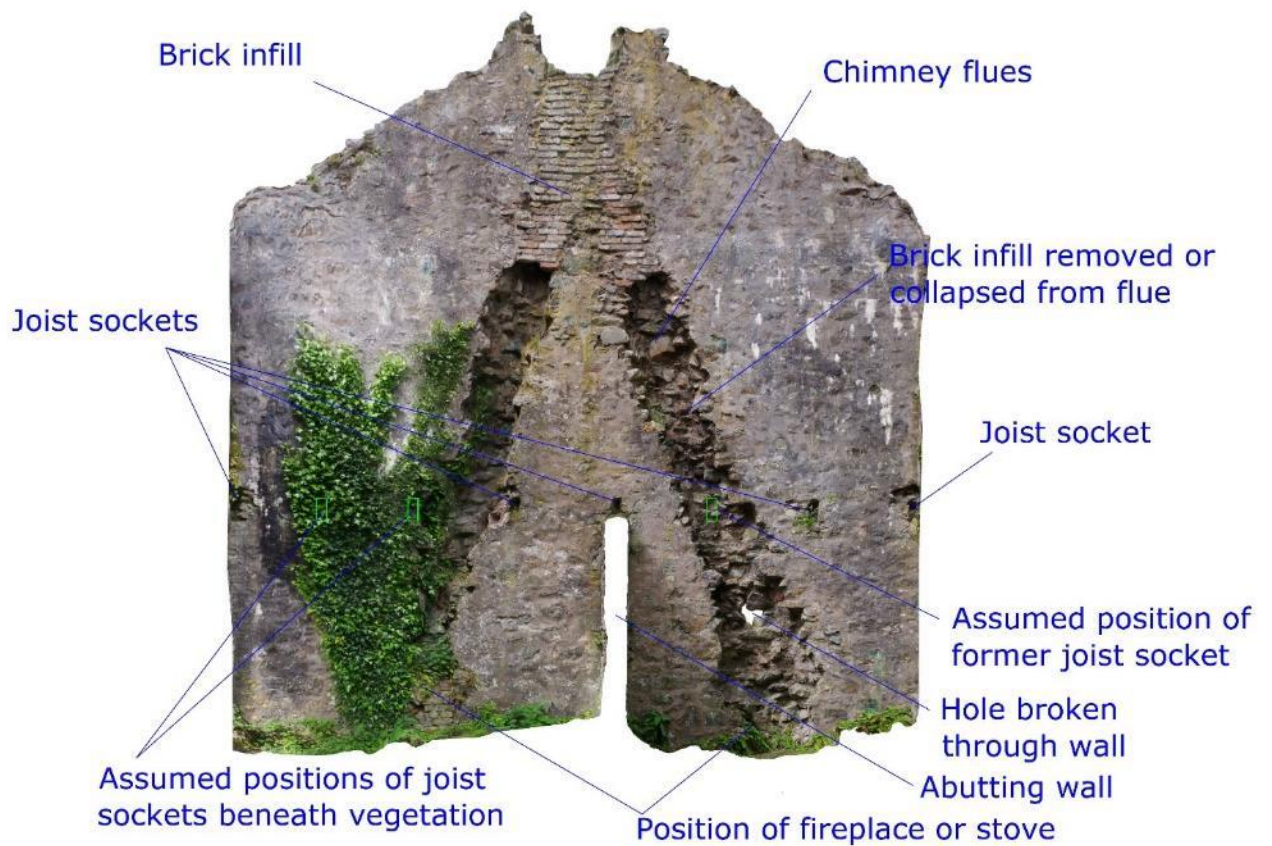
Rooms 7 and 8 (ground floor) and 10 (first floor), orthophoto of the west wall.
